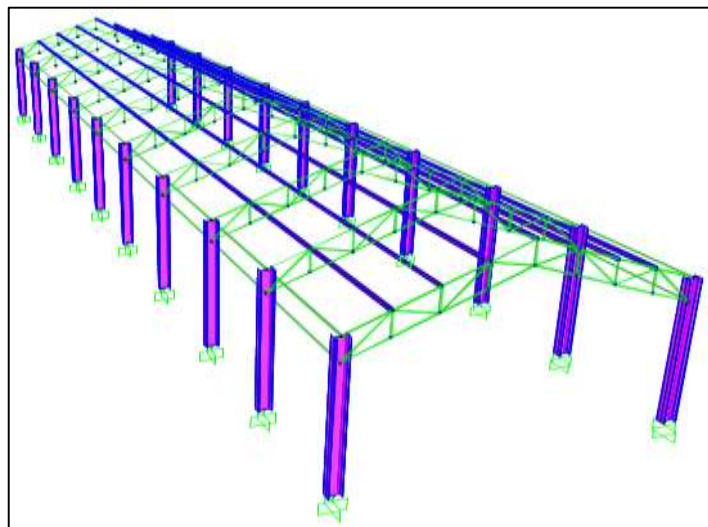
Model structure of warehouse with trusses roof in SAP2000 (3D)
